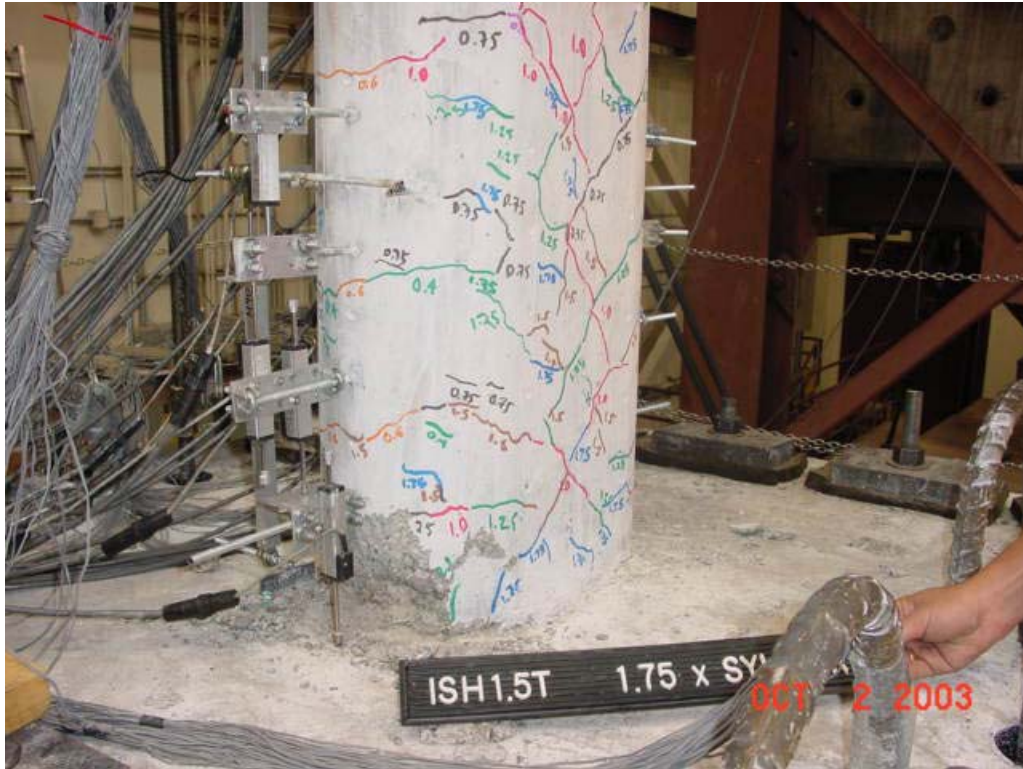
Increasing of Flexural, Shear Crack and Spalling ($\mu_d = 2.5$) Specimen ISH1.5T
